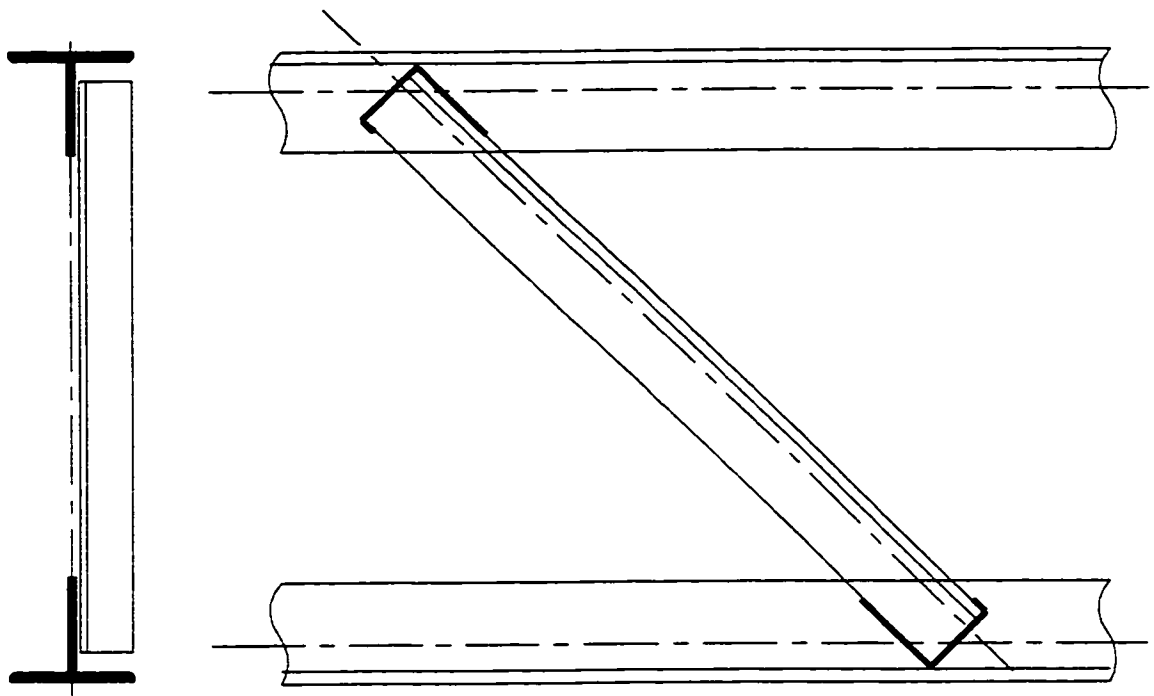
Single-angle web member welded to tee section chords
